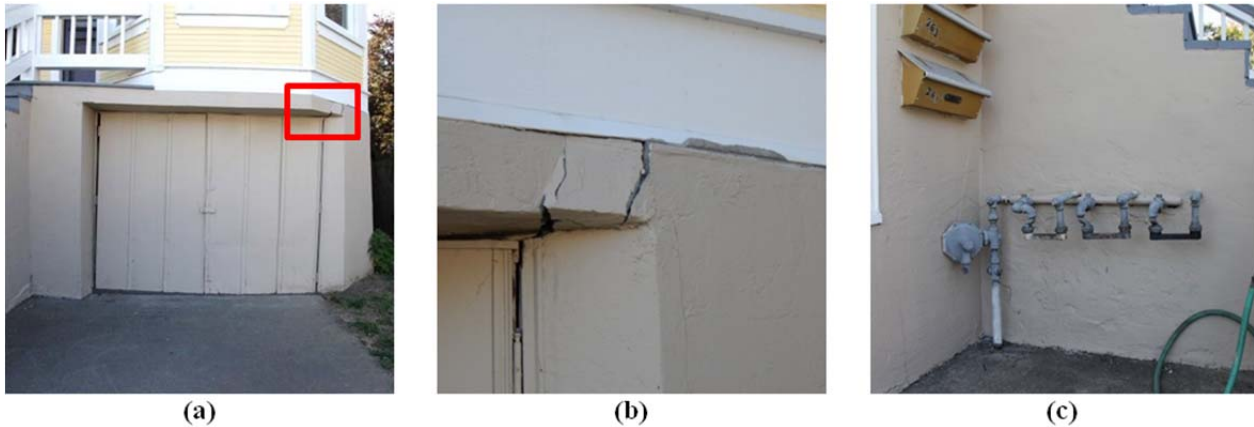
Details of damage at red-tagged residence at 1261 Jefferson Street: (a) soft-story development seen at garage door with outline of support failure; (b) close-up of top-right corner of garage door and corner support failure; and (c) horizontal cracks along gas line.
